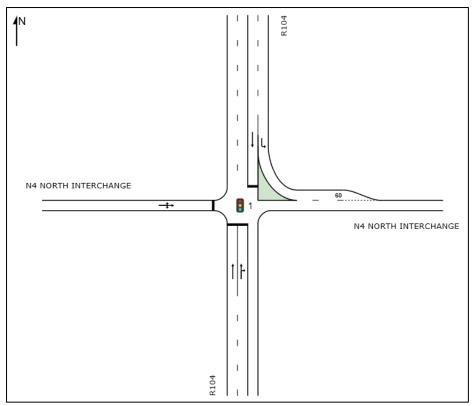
Intersection 1 Proposed Layout (Background Traffic)
